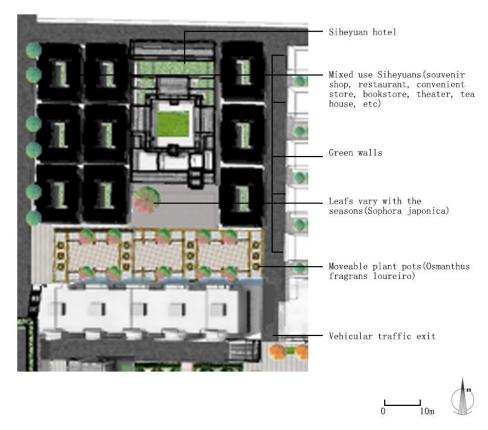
Illustrative plan showing the Yongning Road ancient architectural complex Source: Author
